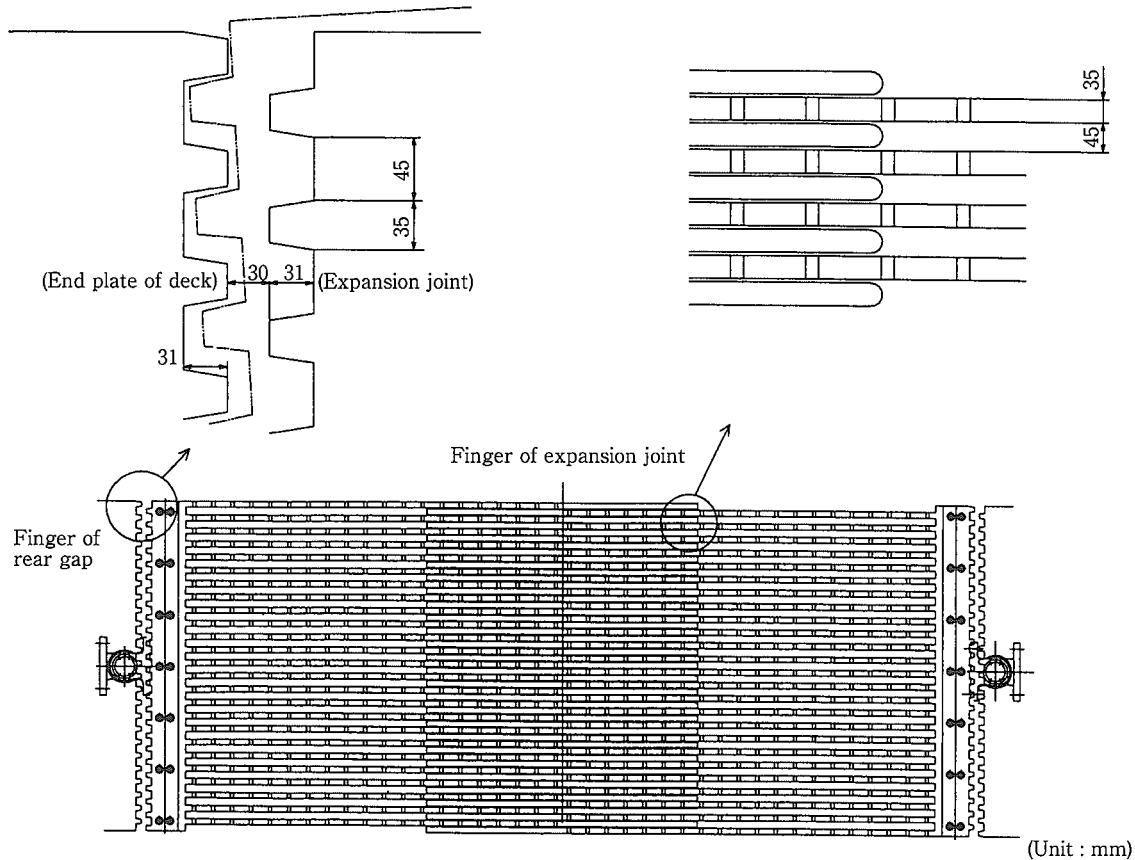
Detail of finger section of expansion joint on center span side of tower
